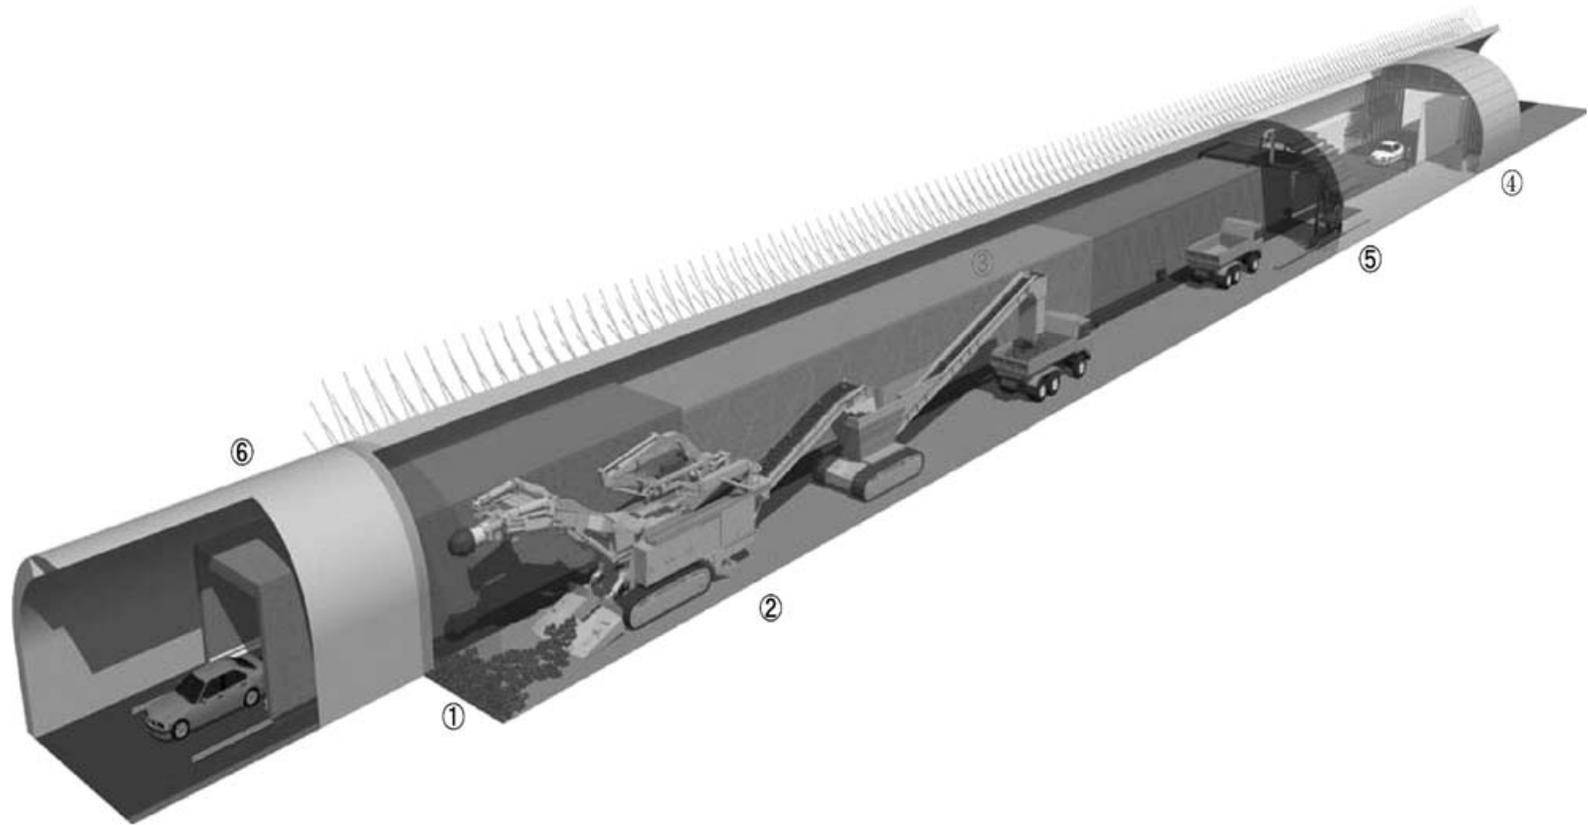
Crescent Cross Section Method: 1) Crescent Enlarged Excavation; 2) Multipurpose Excavator; 3) Movable Shield with Different Strength; 4) Concrete Form; 5) Frame for Installation of Sheet Membrane; and 6) Existing Tunnel (Reference 1)
